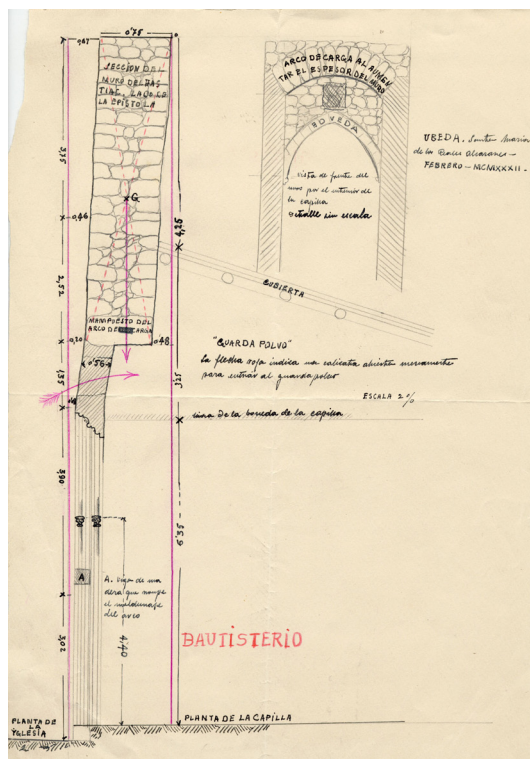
Partial section of the gable wall on the Epistle side and elevation of the relieving arch of Santa María de los Reales Alcázares in Úbeda (Jaén), February 1923, M. Campos Ruiz. Paper, black and pink pencil, 32x22 cm (APAG / Plan Collection / P-008767).
